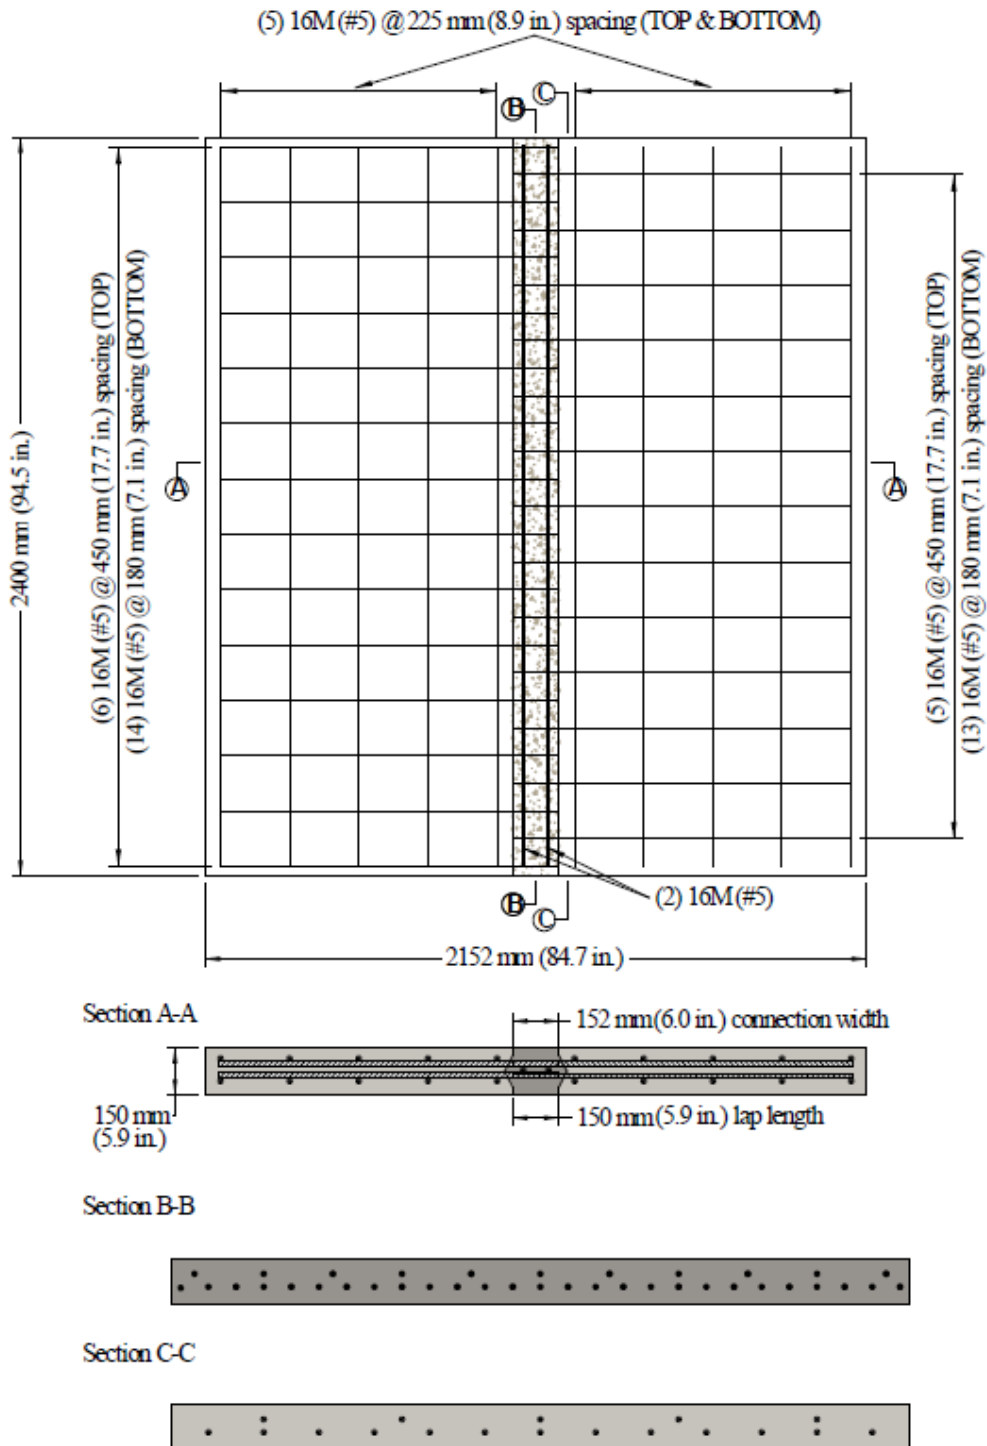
Layout and Rebar plan for Concrete Panel 6B (Graybeal, 2010)
